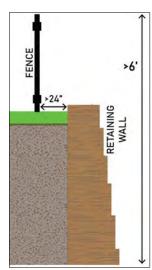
A-2-E-2-II: Requirement for fence location when retaining wall is not adjacent to walkway and fence + wall is taller than six feet.
